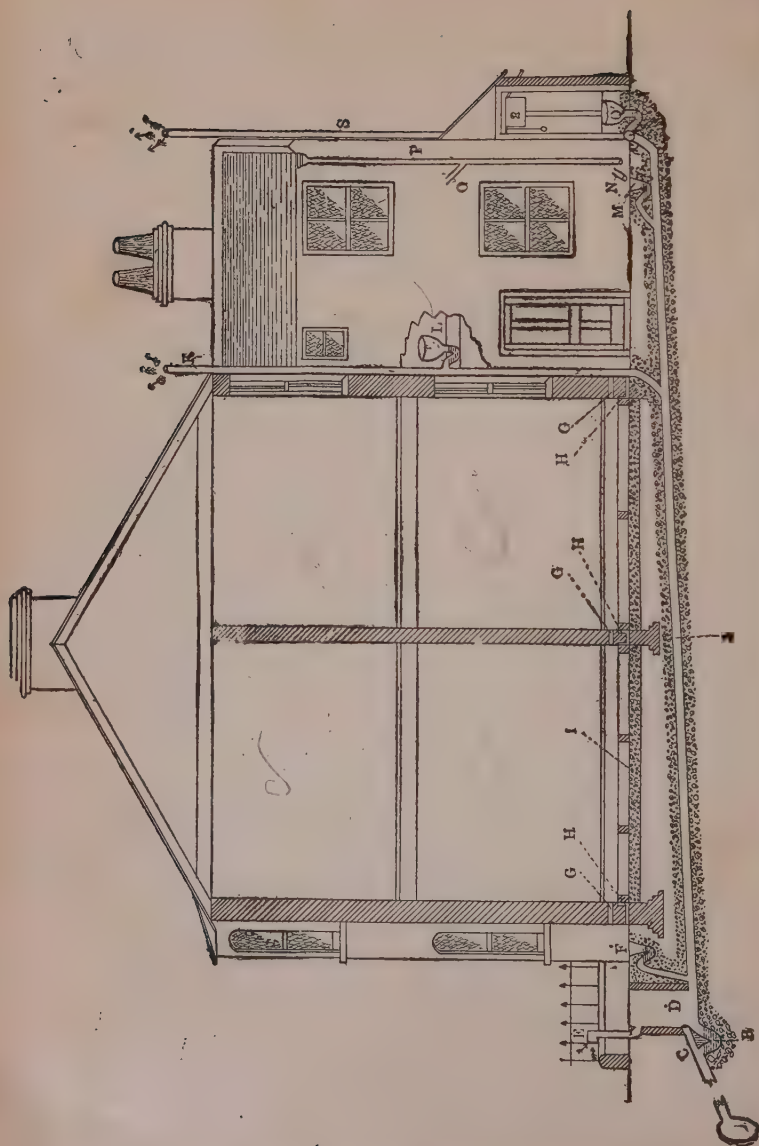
SECTION THROUGH A HOUSE FROM FRONT TO BACK SHEWING DRAINAGE ARRANGEMENT. •
